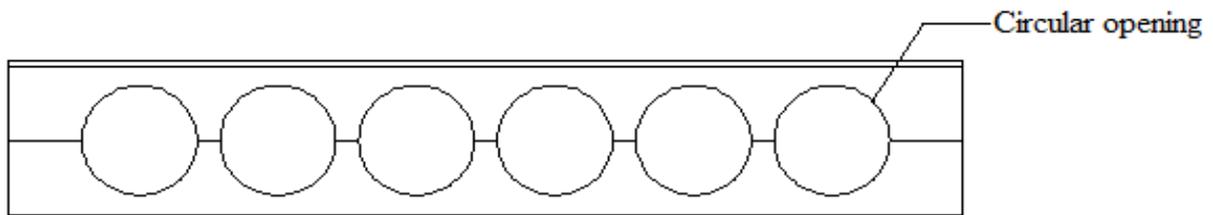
Castellated beam with circular opening (Cellular beam)
